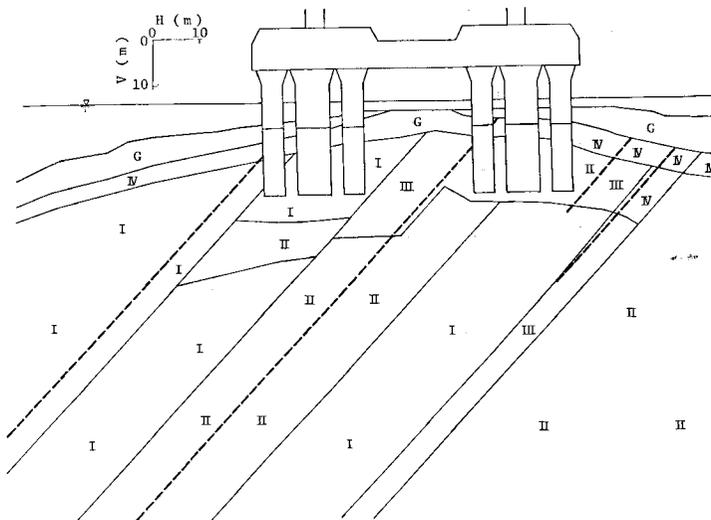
Modeling of Geologic Site at Pier Type Foundation.
